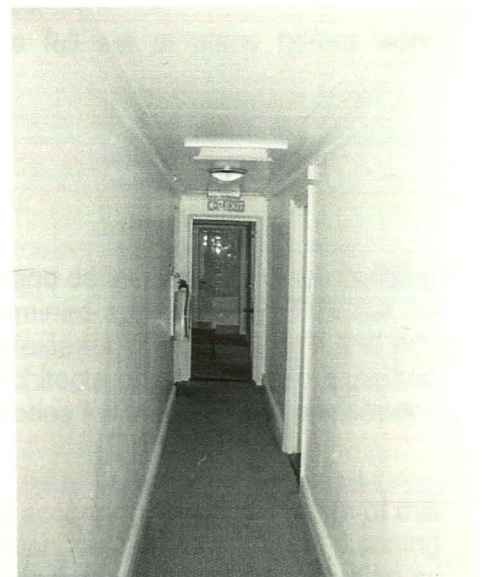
View Down 1st Floor Corridor, Through Room 108 to Bathroom, looking east
